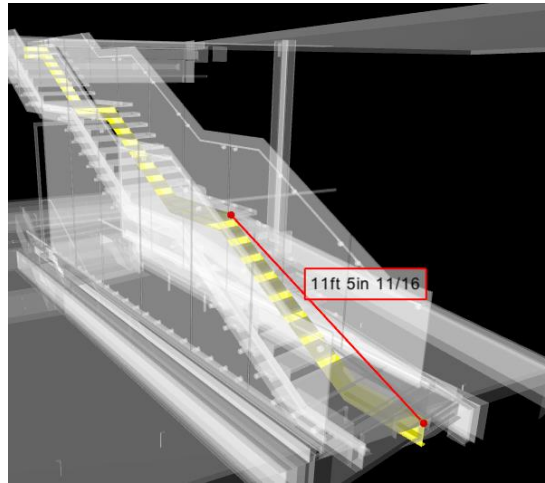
Atrium Stair Stringers Projected Distance Between Splices
